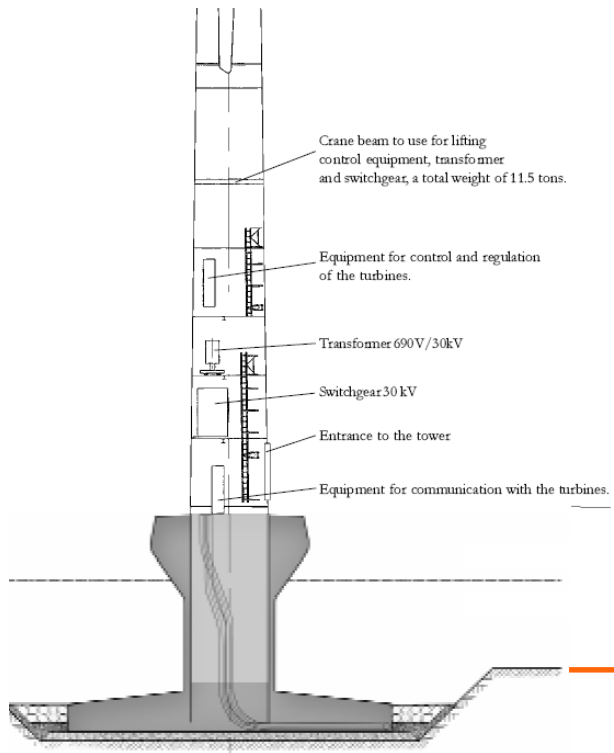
Design of concrete gravity foundation. The height of the total foundation is between 11.3 and 8m.
